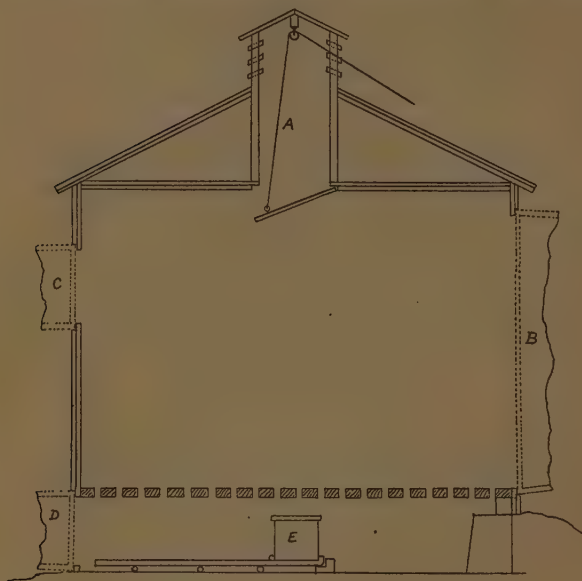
Diagram showing cross-section of a fumigating house 10 x 10 x 8 feet in size, with slat floor. A, ventilator that can be opened and closed from the outside; B, door where trees are carried in and out; C, small door opposite large one for ventilation; D, small door for communicating with generator; E, jar for generating the gas.
